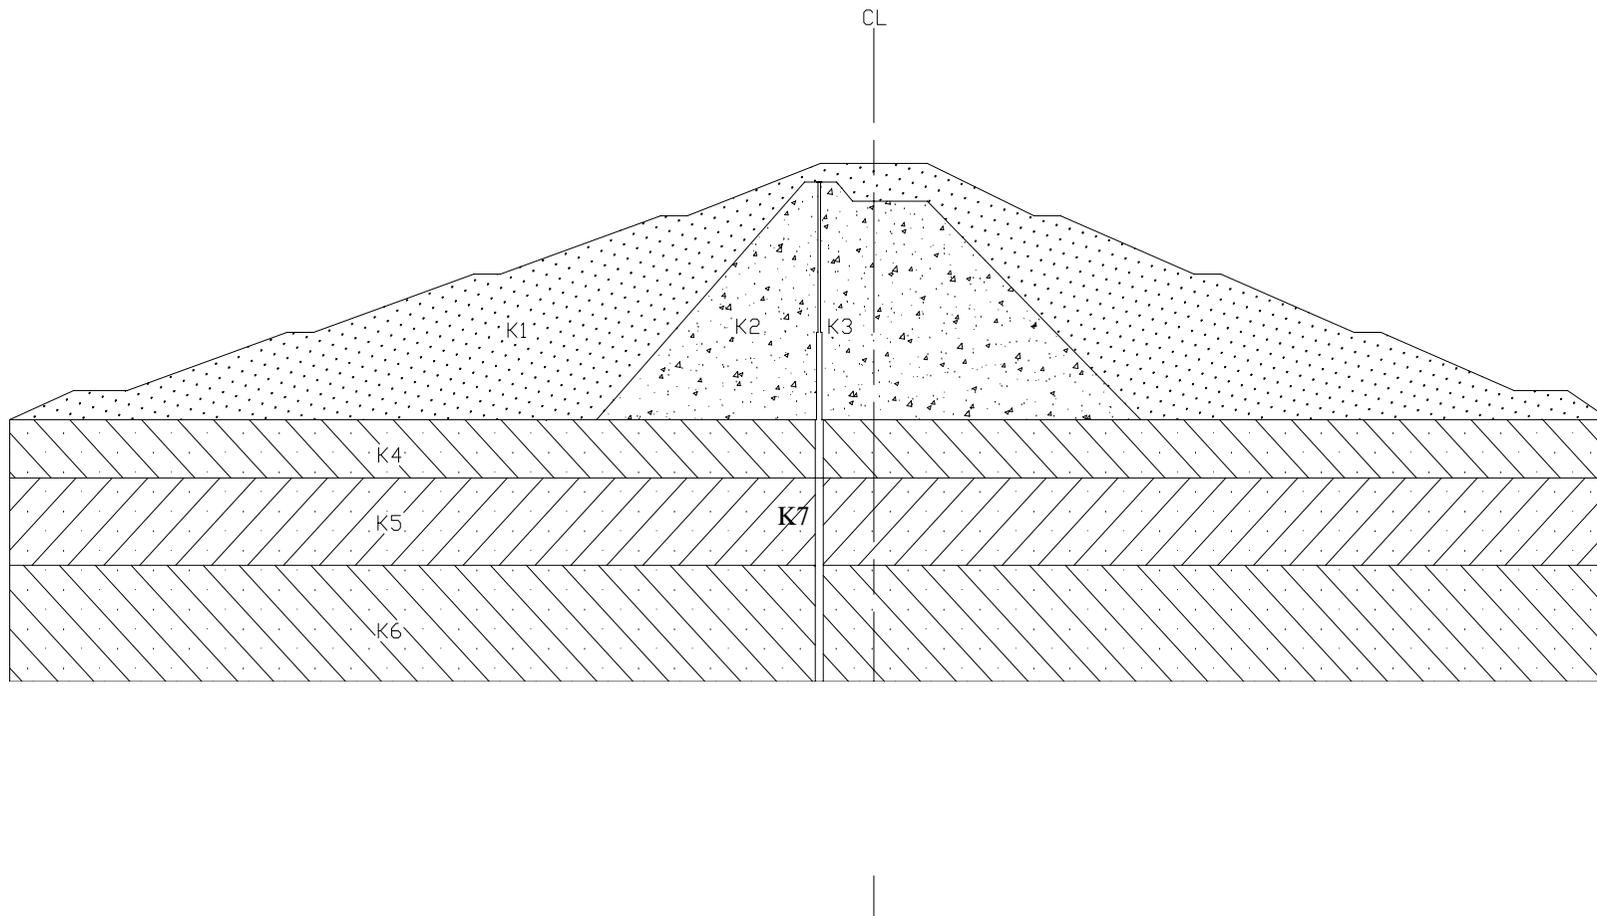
Typical cross-section of AL-Qadisiya Dam at station 42
